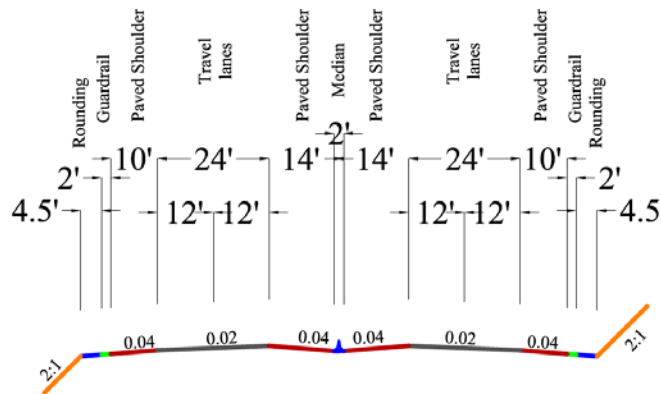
Typical Section for Widening of Existing US 220 in Segments A, C, E, and H
